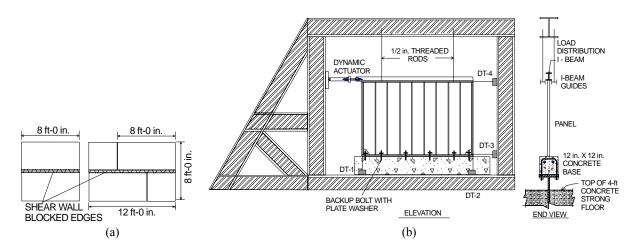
Test assembly and setup: (a) sheathing orientation and layout; (b) test setup.
